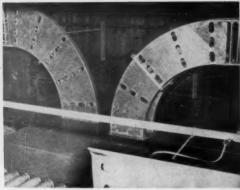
Giant pullbox shown in lower left of this photo (looking up from the floor) is mounted about 18 ft above the plant floor against the inside building wall adjacent to the main outdoor switch-gear. The conduit runs from the main switchgear can be seen coupling to the bottom of the box and the three main trunks of tray, carrying all of the plant feeders, are shown coupled to the box, from which point they supply the entire layout of tray sections and subsections. The tray sections are supported by trapeze hangers with their rods secured to framing channel fastened to wood floor ioists above.
